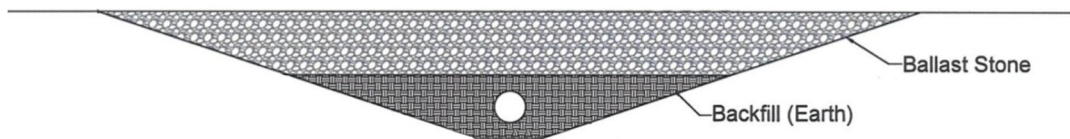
Ocean Outfall Profile (Not to scale)
